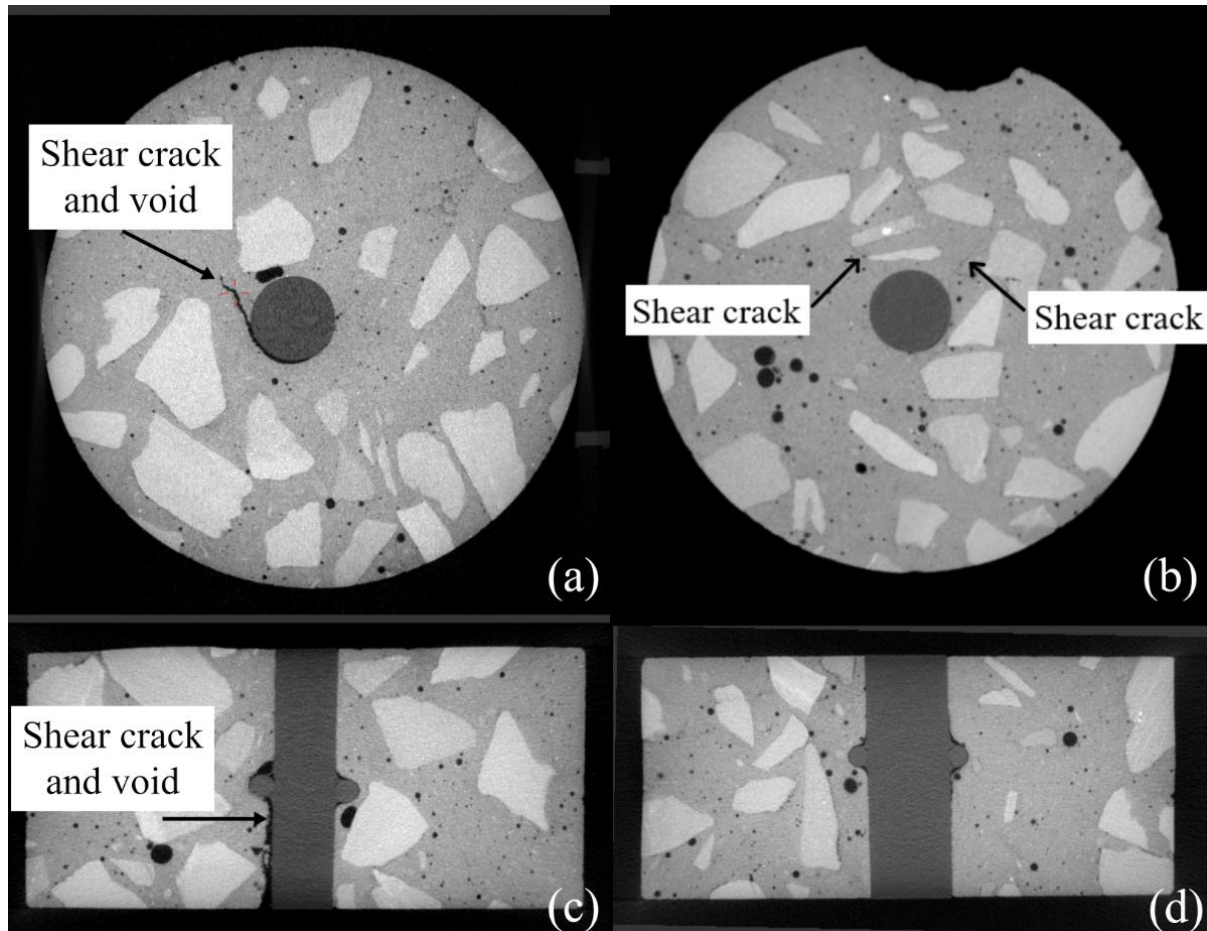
CT scans of (a) Beam 5 – 50 mm cover front section view, (b) Beam 2 – 50 mm cover front section view, (c) Beam 5 – 50 mm cover top section view and (d) Beam 2 – 50 mm cover top section view)
